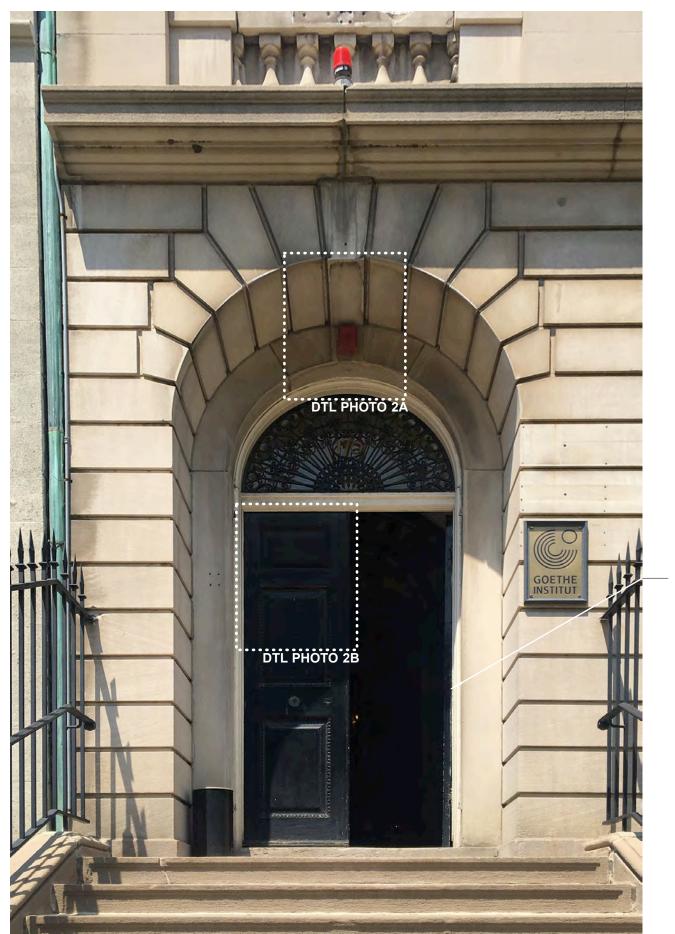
PHOTO - EXISTING STOOP TO FRONT ENTRANCE
